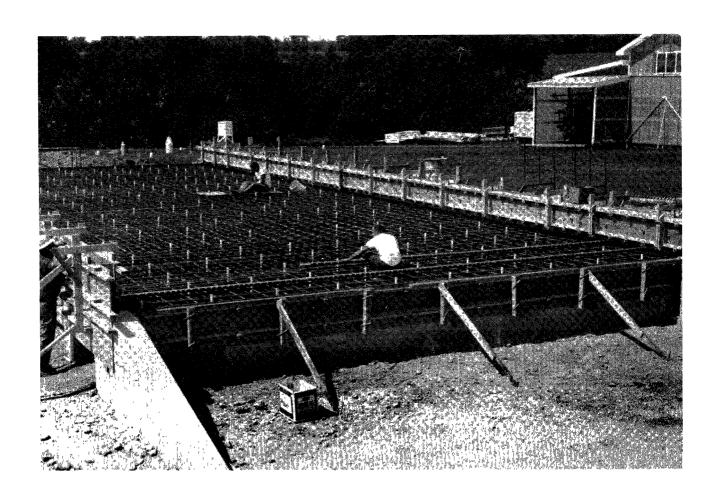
Installation of the lower access tube prior to pouring of concrete floor on the platform.
